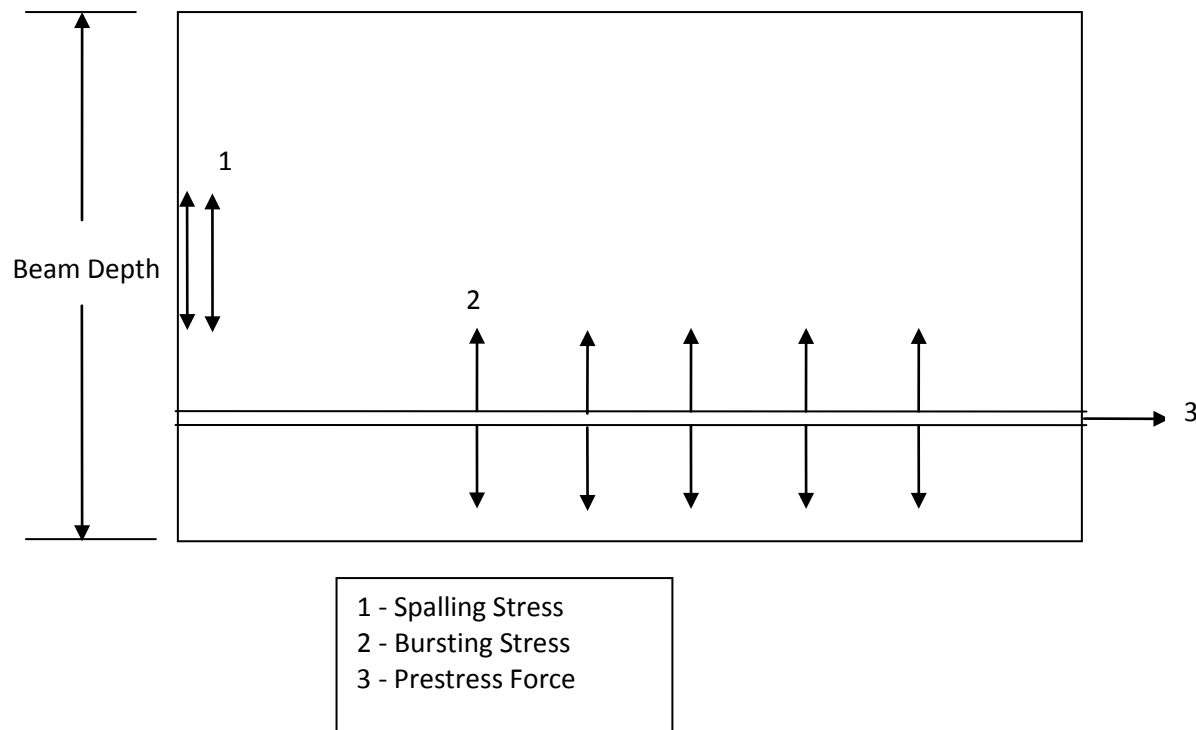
Spalling and bursting stresses near the end zone of prestressed members
